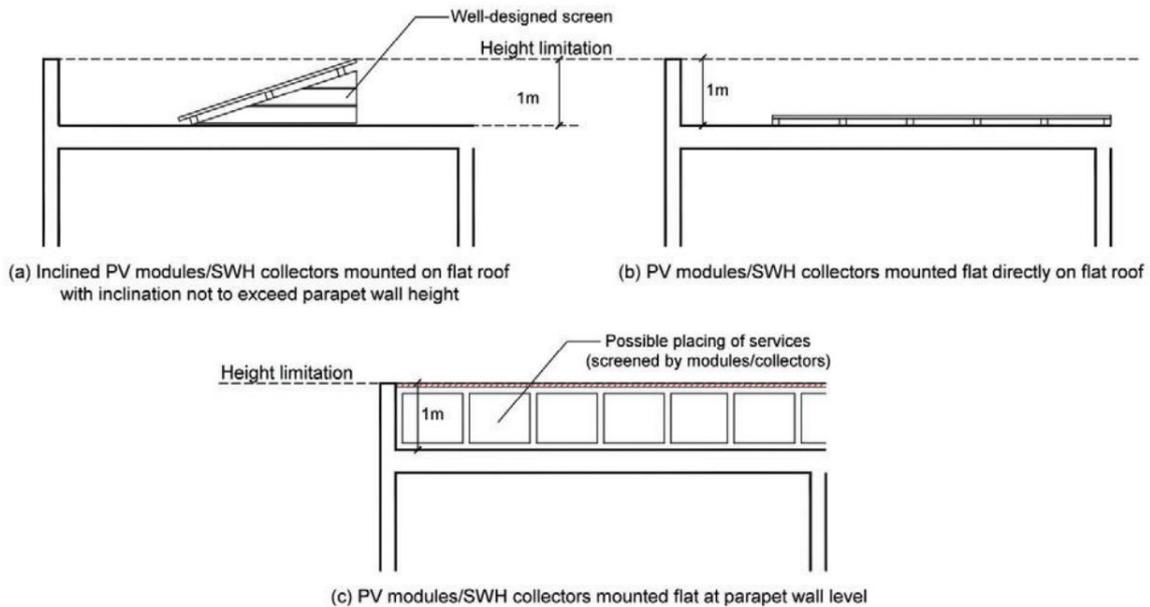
Options for PV modules and SWH collectors mounted on a flat roof
